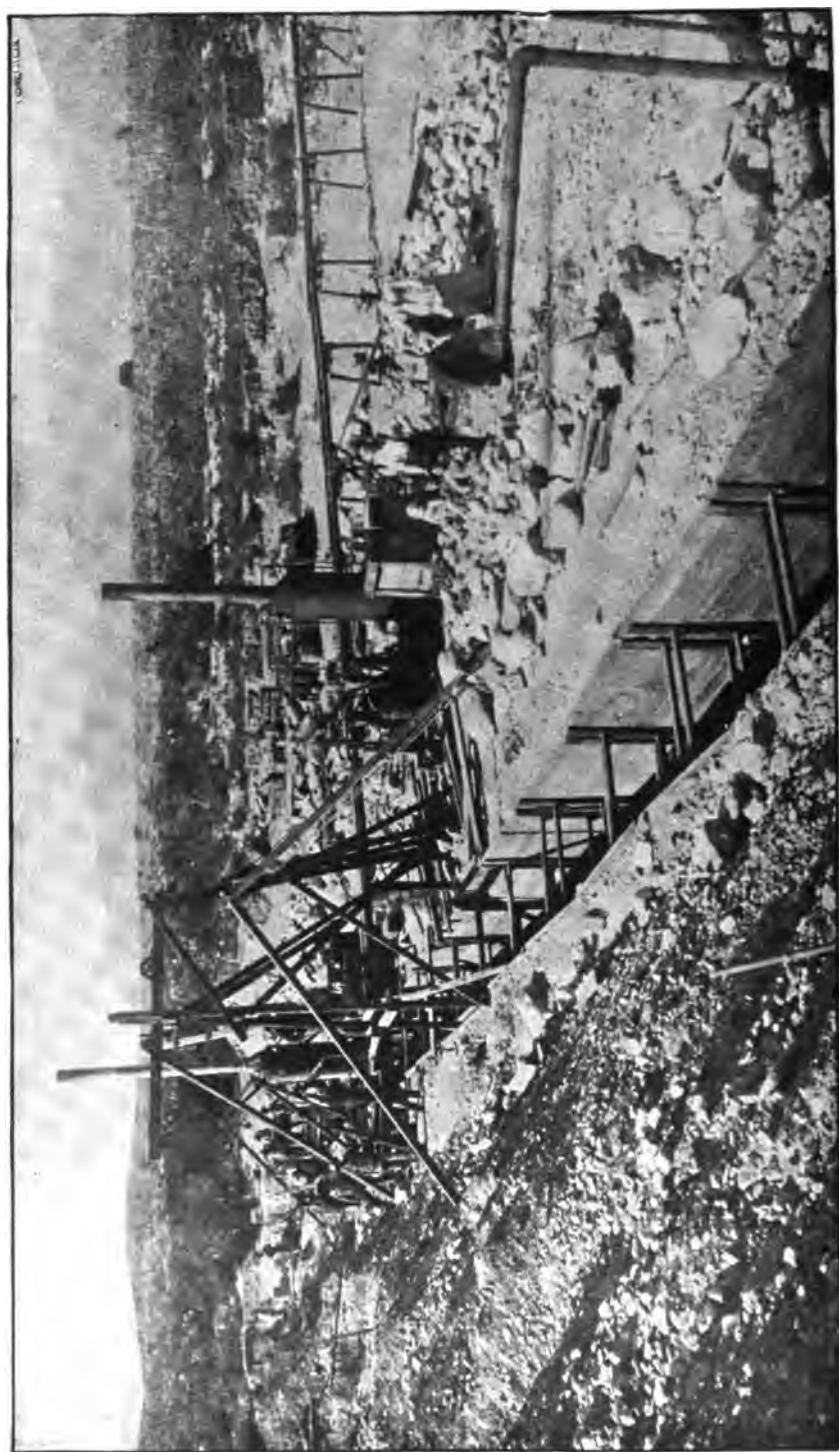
EXCAVATION OF TRENCH FOR PACOIMA SUBTERRANEAN DAM.
